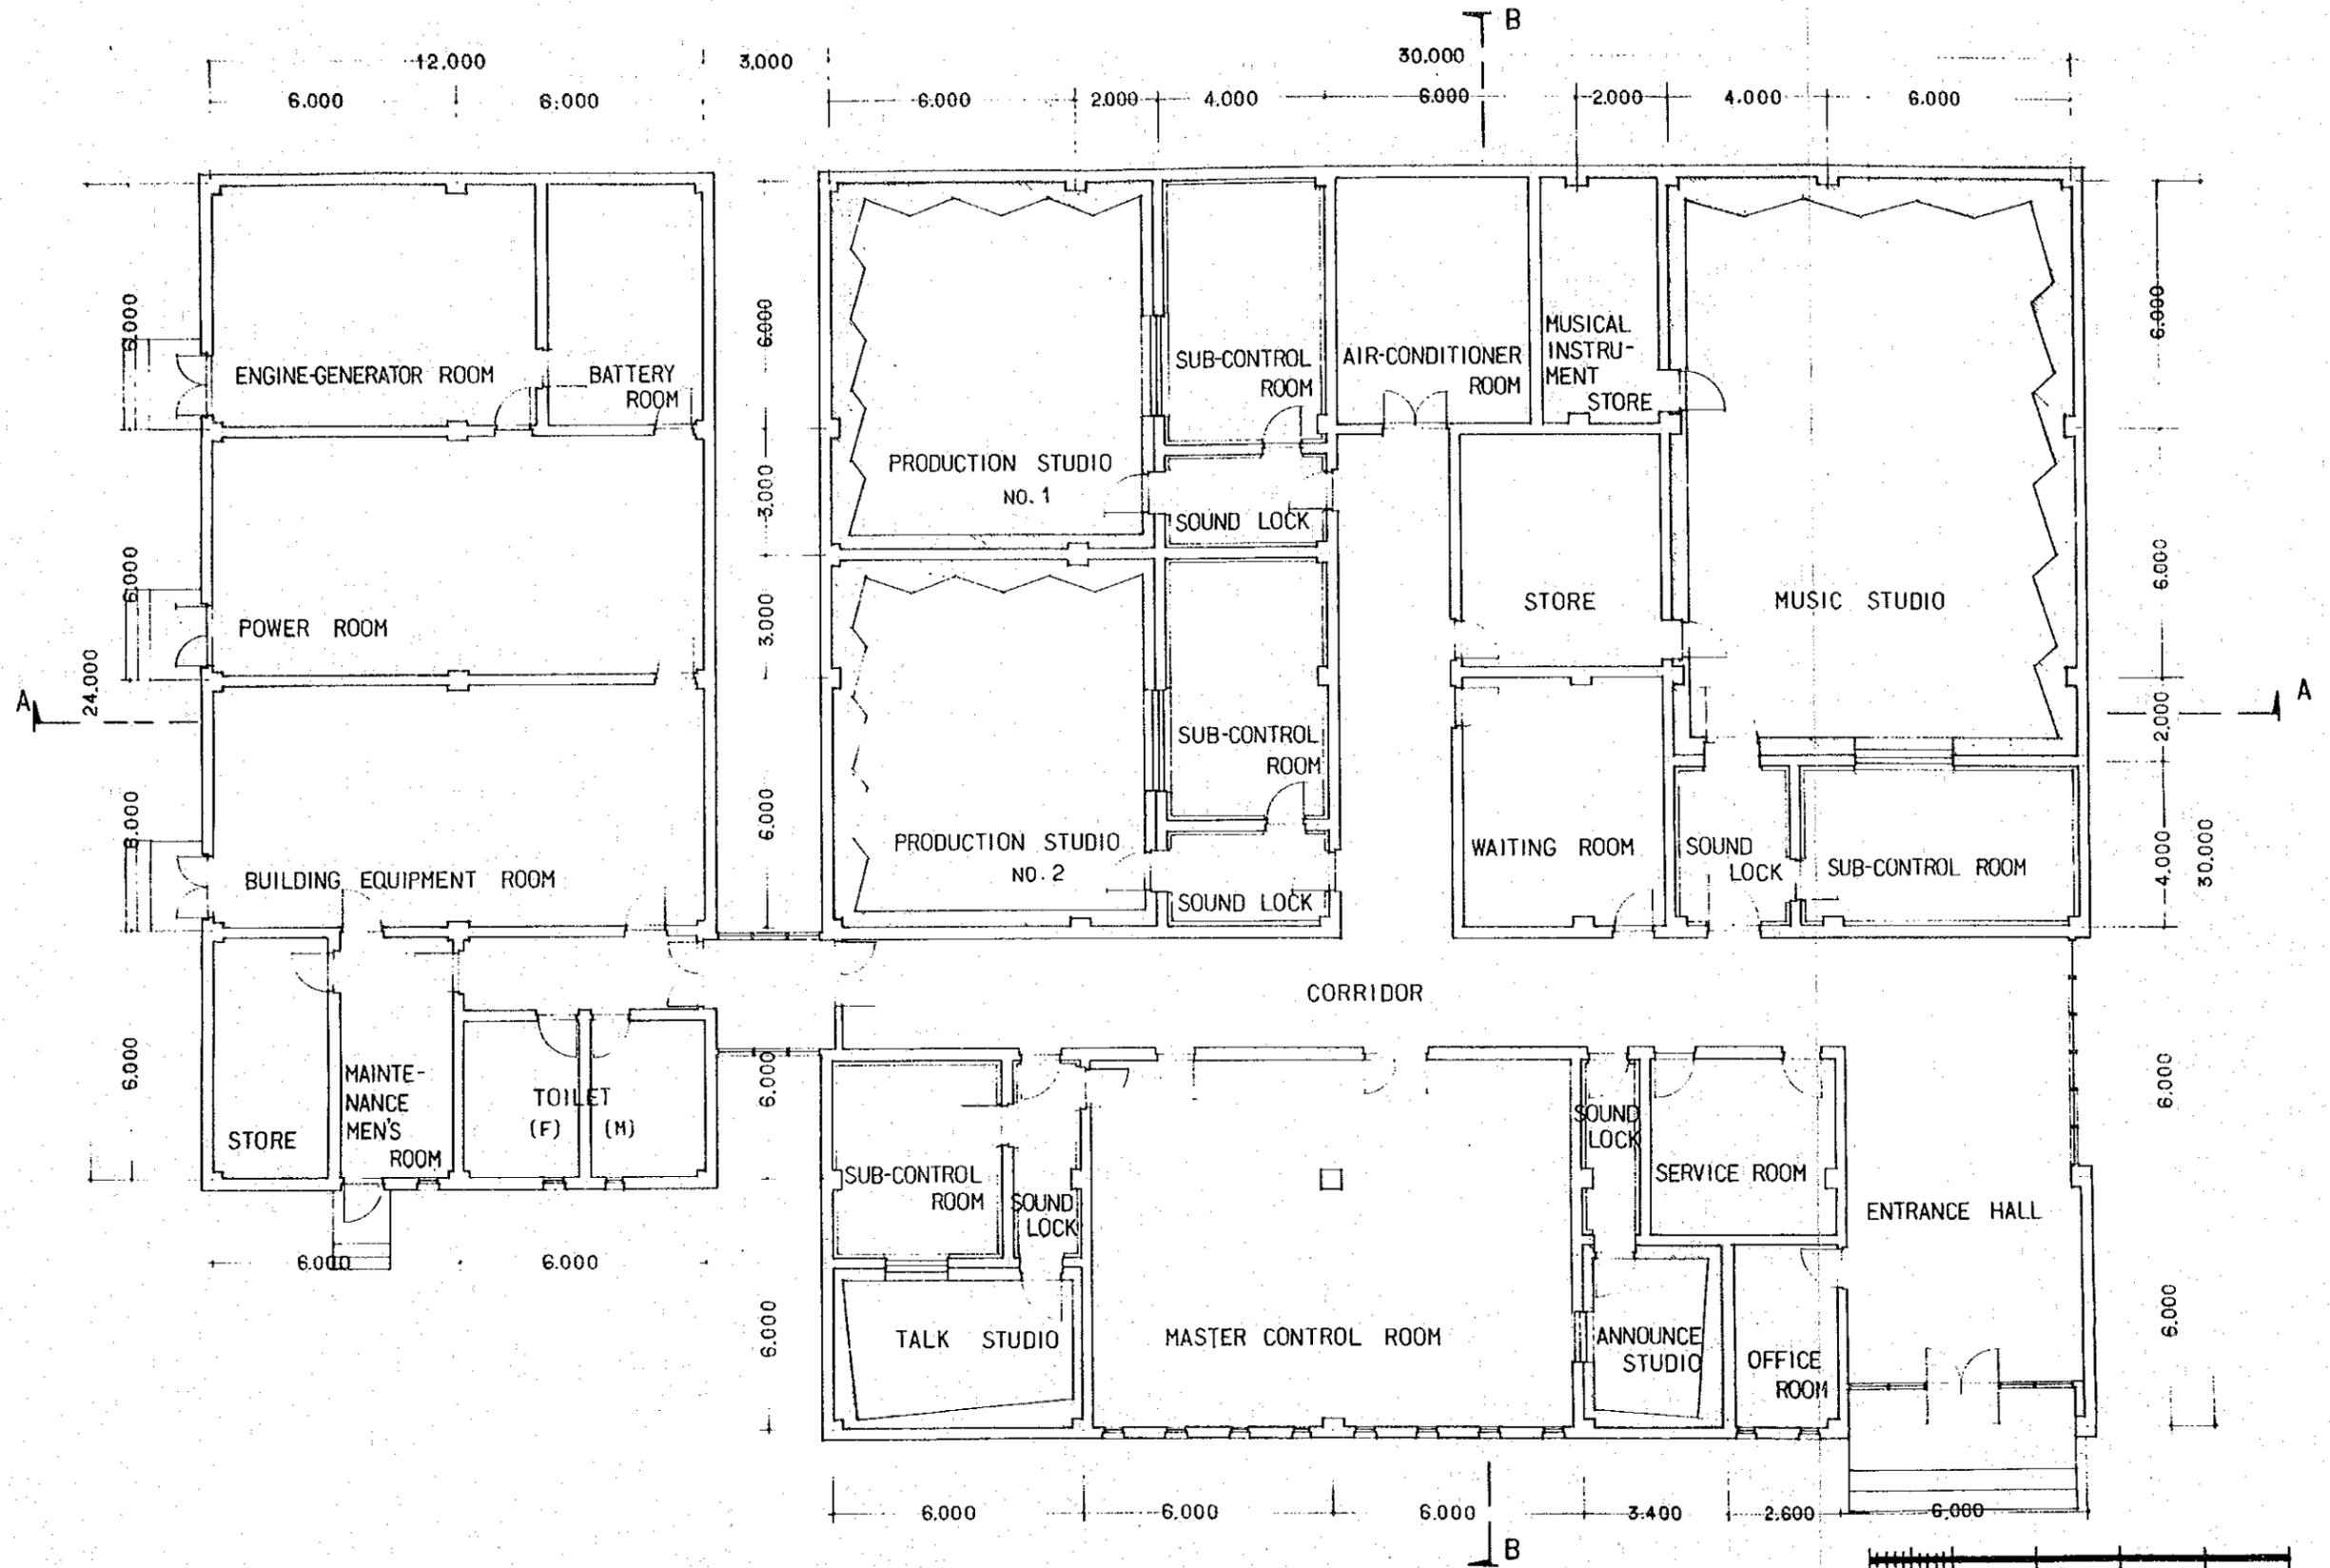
FLOOR PLAN — KATHMANDU STUDIO CENTER
